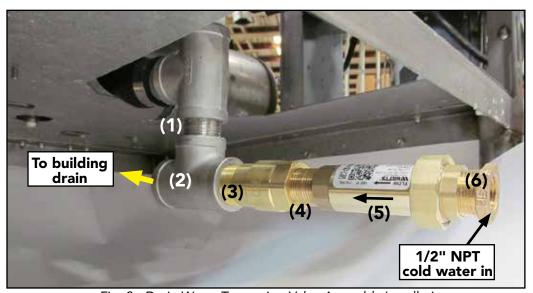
Drain Water Tempering Valve Assembly Installation
